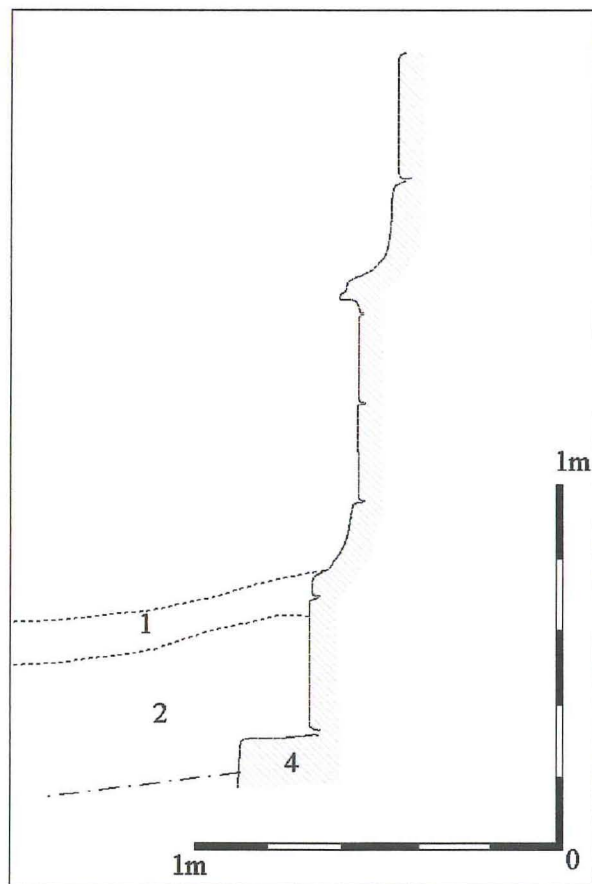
Profile of the carved moulding and footings at the base of the tower west wall.
